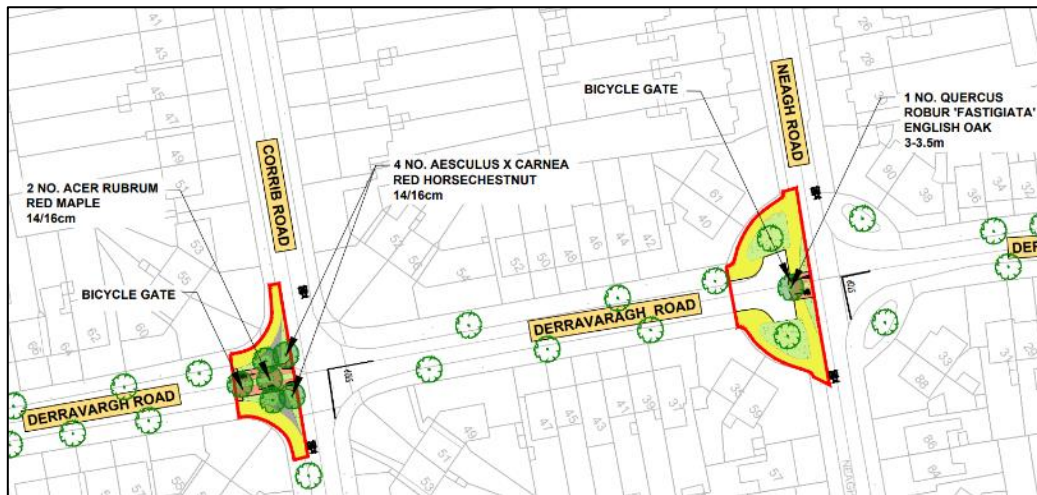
Proposed Road Closures at Derravaragh Road
